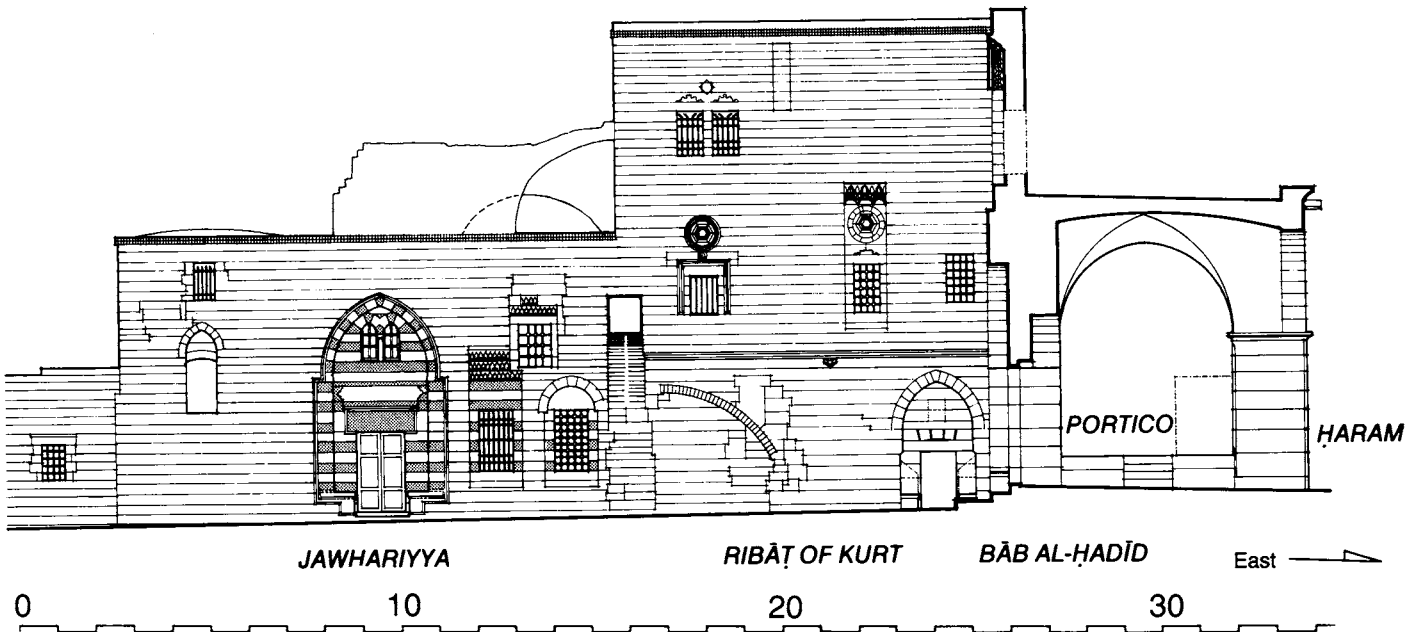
Elevation of north side of Bāb al-Ḥadīd
